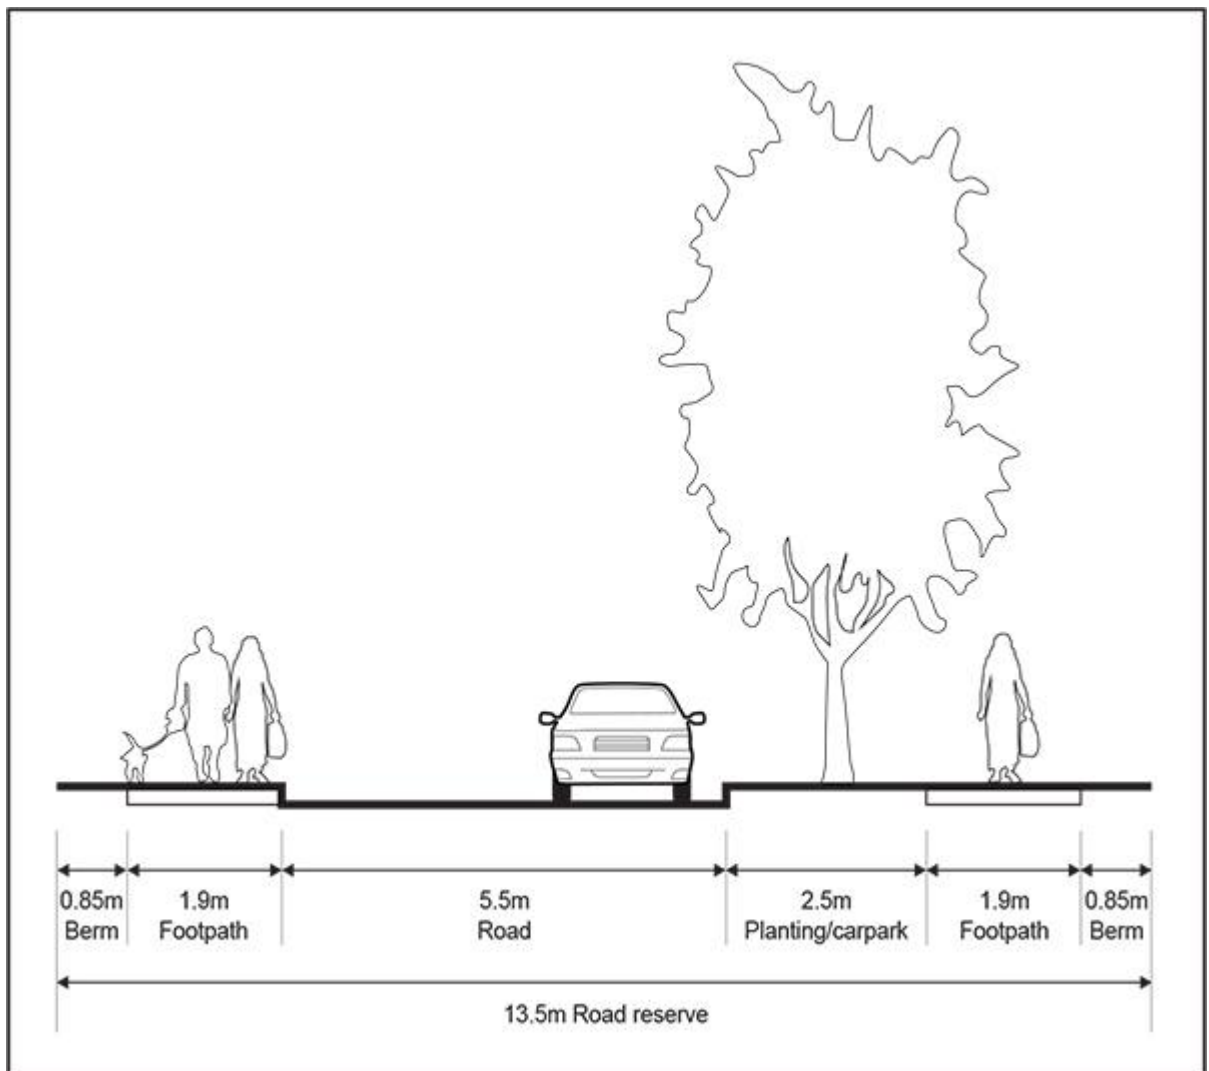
Indicative Street Section for all other streets (13.5m wide)I311.8.2.2. Design of car parking, access and servicing
